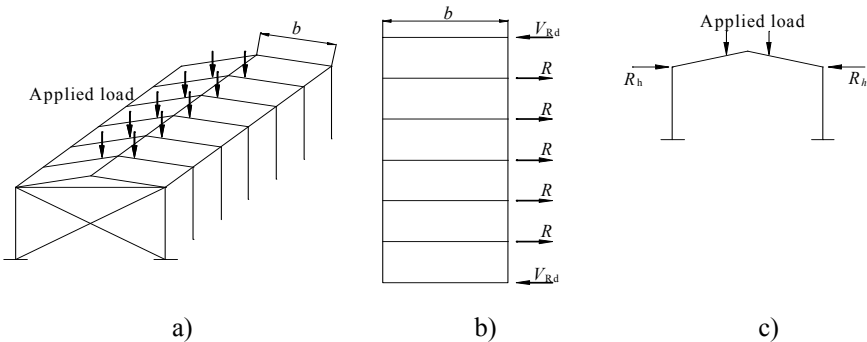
Distribution of vertical loads for plastic design of clad pitched roof portal frames
